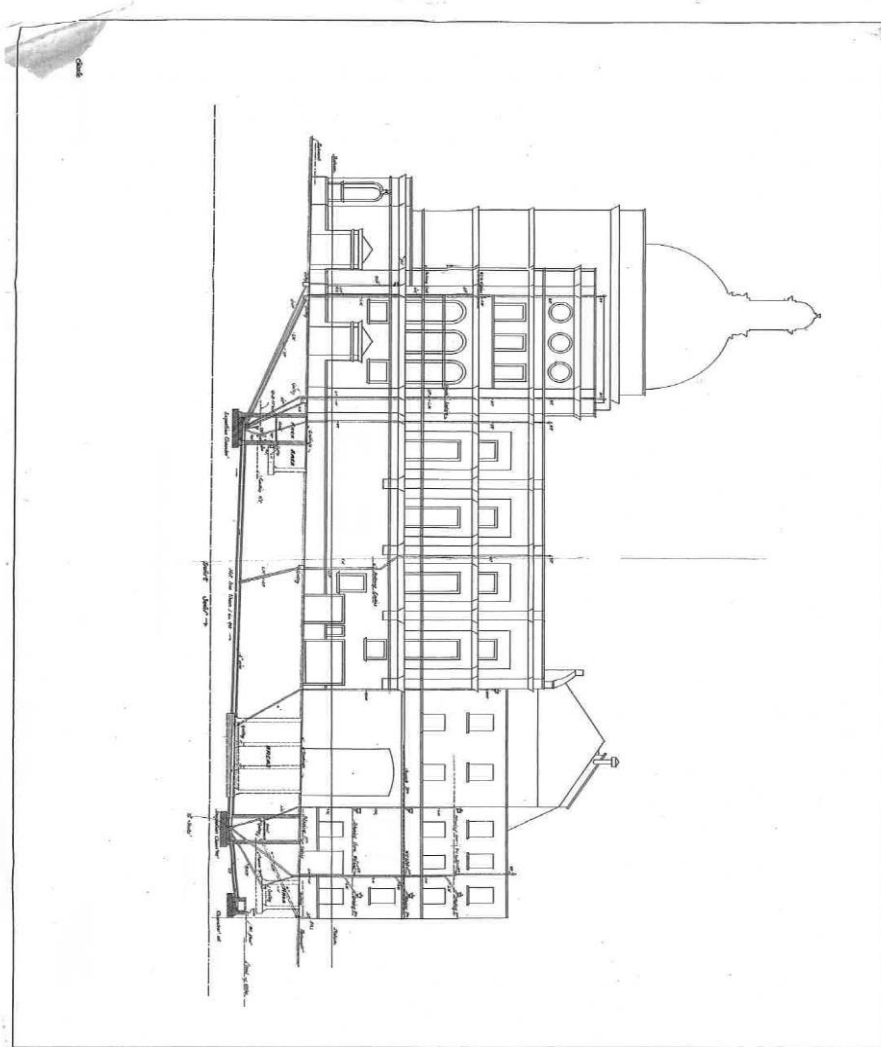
Elevation to Crowndale Road. This elevation has not changed, which exception of some of the windows being infilled.
